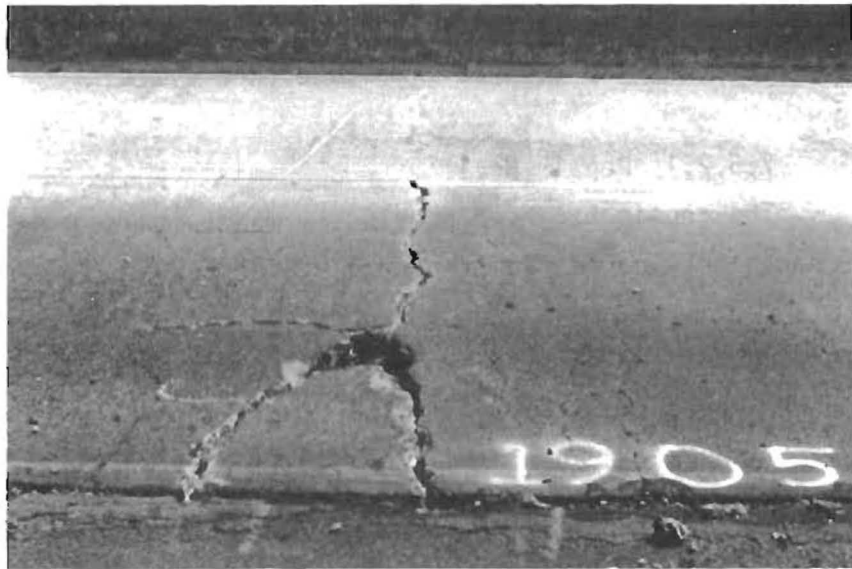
Marshall Repair No. 3 Prior to Widening Cracks
